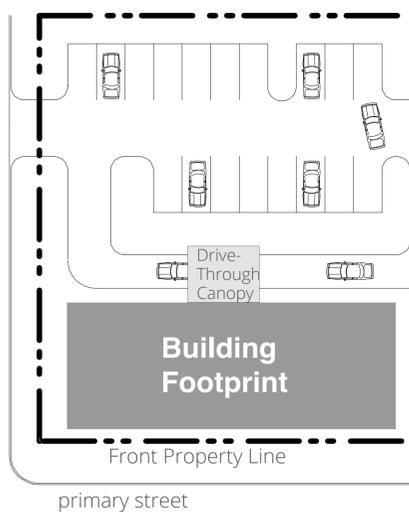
Recommended Drive-Through Facility Layout.
